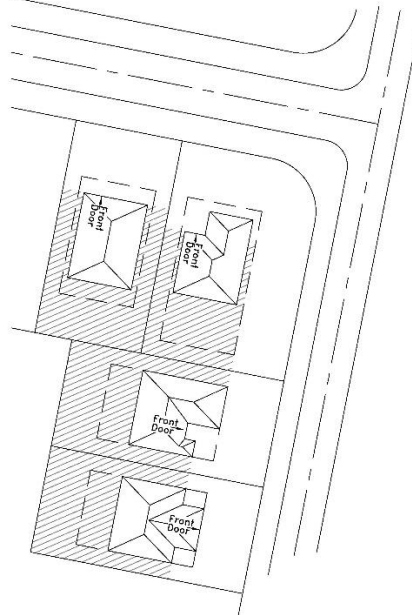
Allowed Accessory Building and Fence Location on Lots Facing Multiple Rights-Of-Way.
